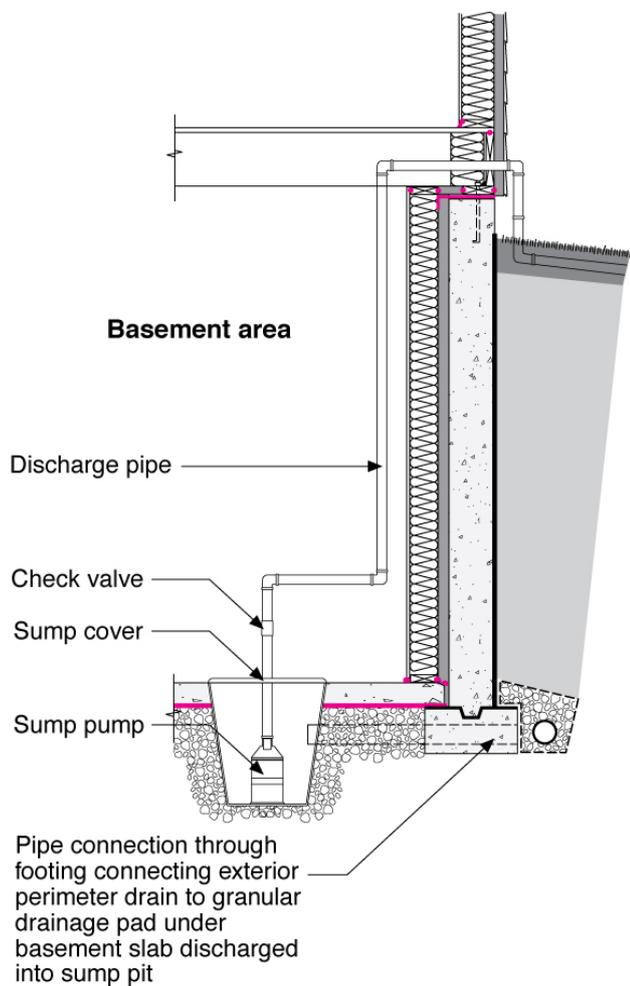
The sump pump is installed in the basement or crawlspace floor to collect water from the foundation drainage piping and pump it out and away from the house to a storm sewer or dry well. (Image courtesy of [BSC](#))
